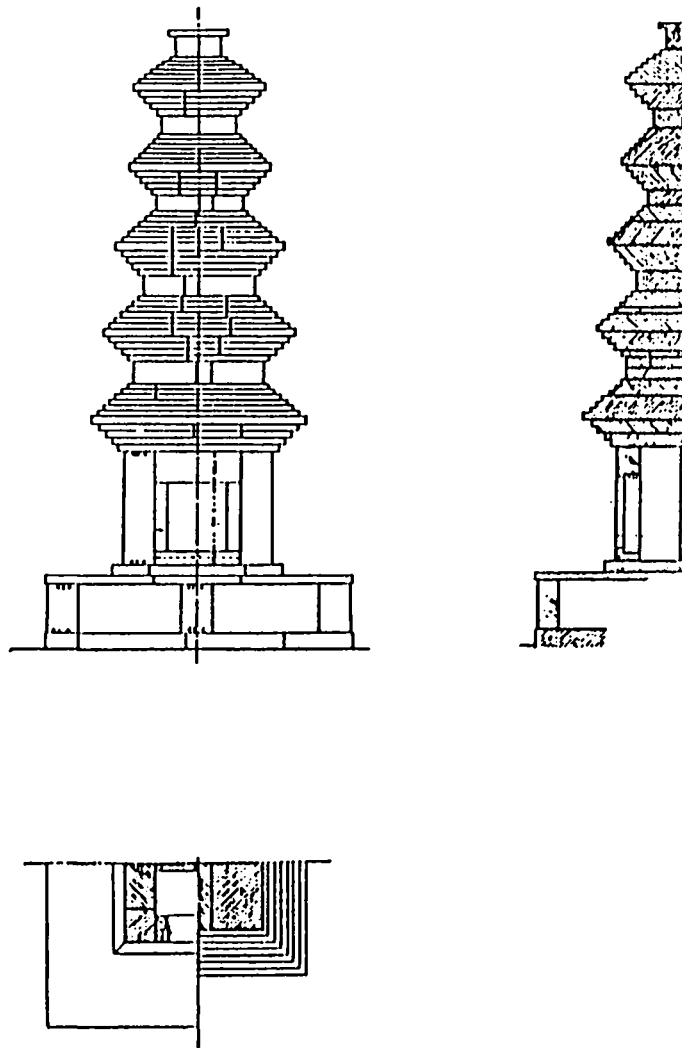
Two partial plans, elevation and partial section of the stone pagoda of Bing-san-sa 氷山寺 氷山寺
